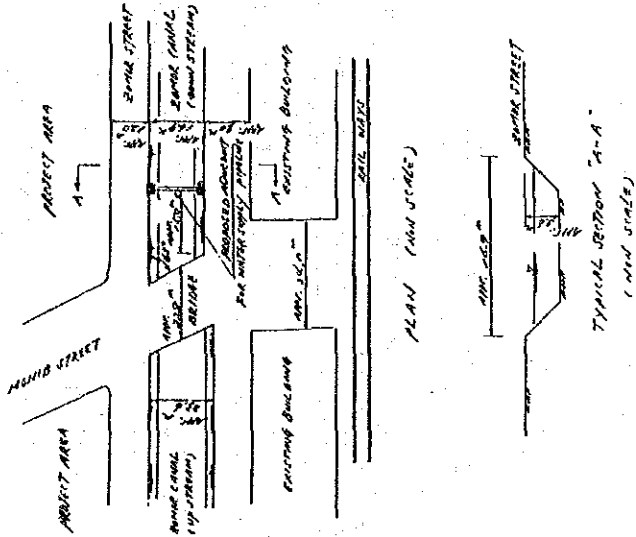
PLAN AND TYPICAL SECTION
